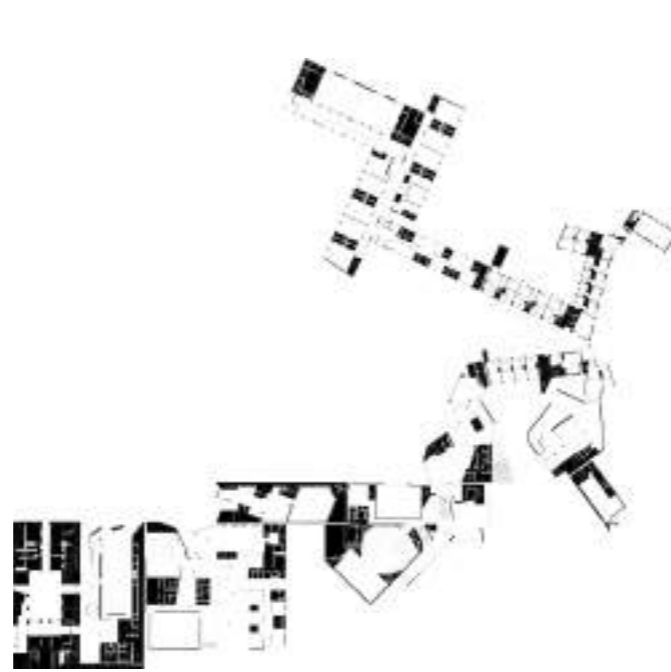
INTERNAL NOLLI PLAN. Composite Nolli plan drawing, Central European University, Budapest, 2013, Sheila O'Donnell, image © O'Donnell + Tuomey Architects.
